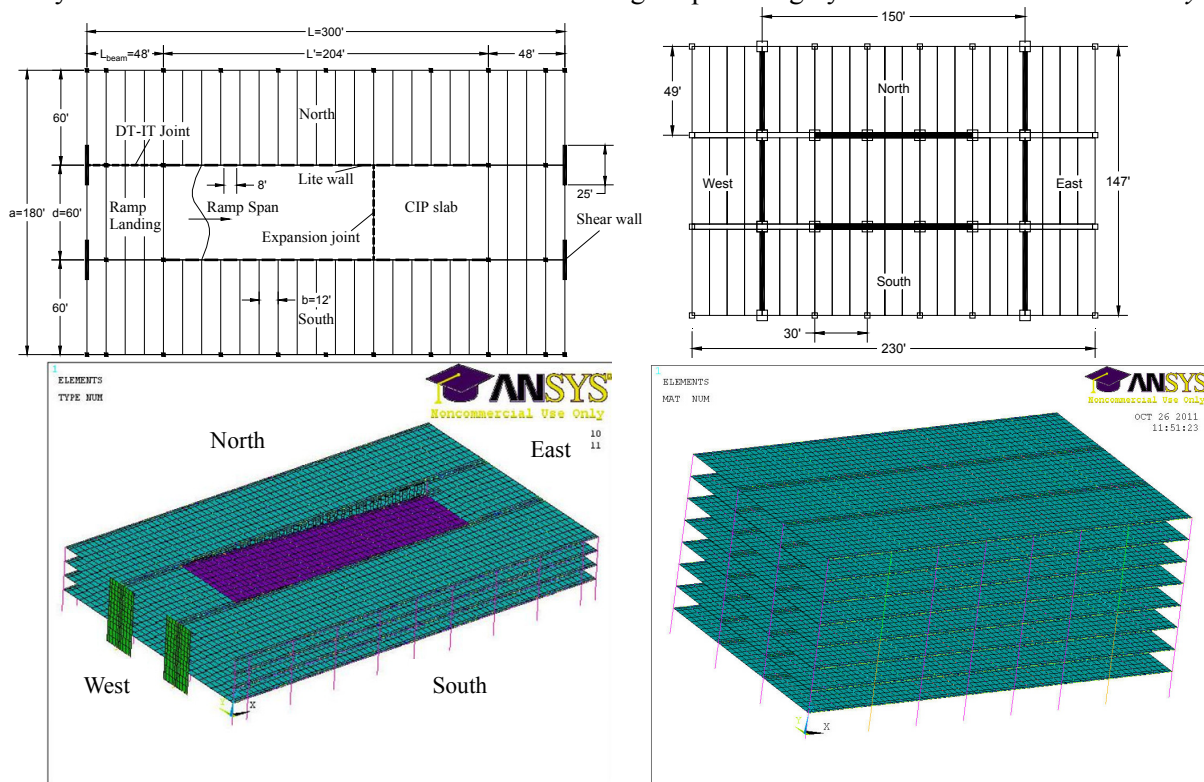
Figure C-III. Precast Prototype Structures Plan and Models: (a) Parking Structure; (b) Office Building.
